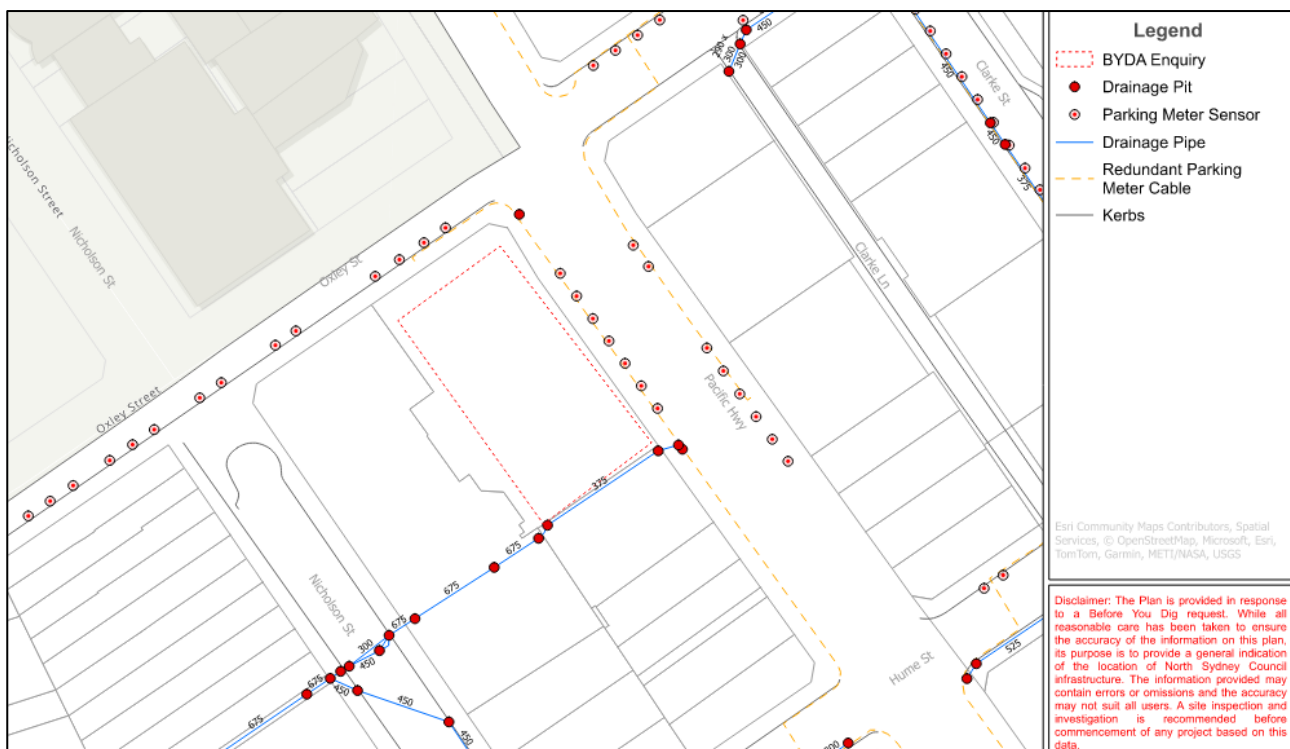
Existing connection pit location (Source: North Sydney Council BYDA)
